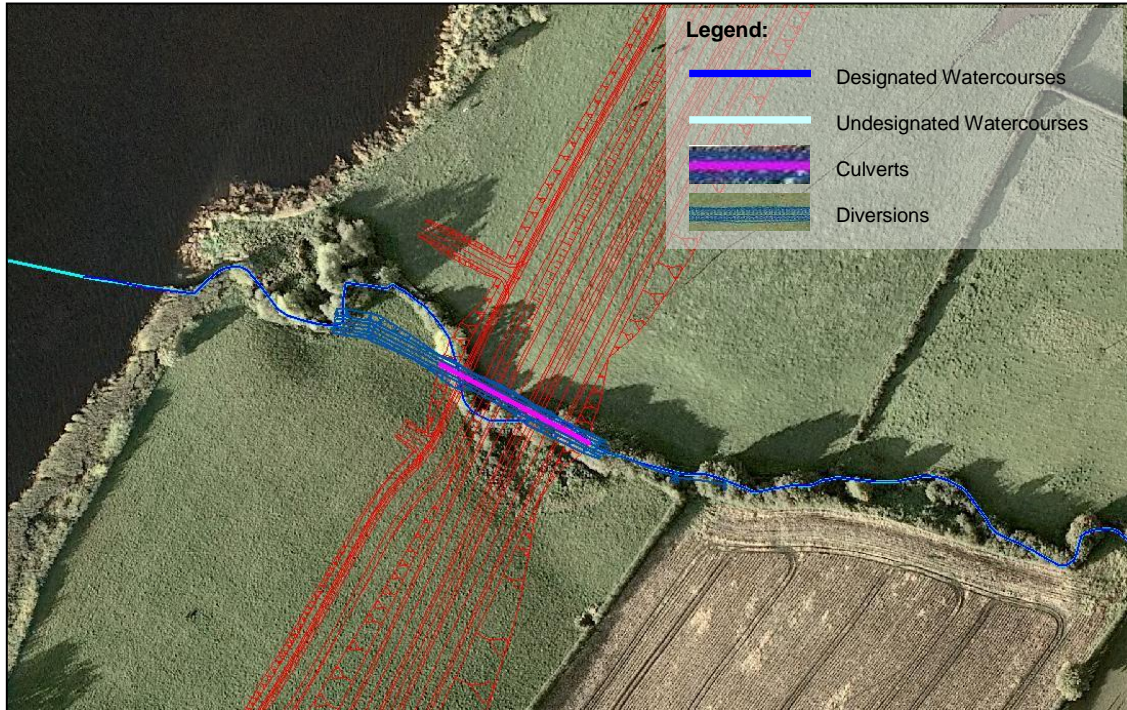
Plan of Gortin Hall Drain Diversion (S1-WD-16) and Culvert Arrangement (S1-PC-03)
